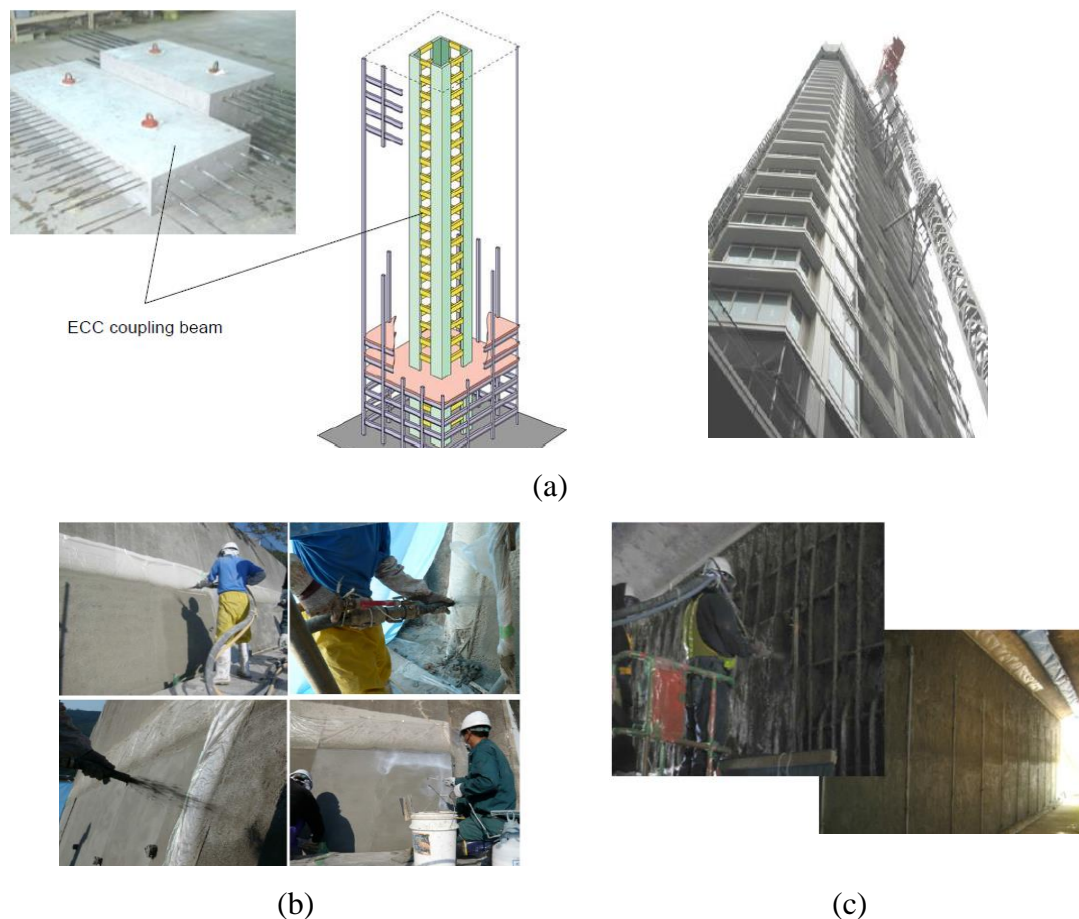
Application of *ECC* in civil engineering projects (a) *ECC* coupling beam in Nabeure Yokohama Tower (b) resurfacing of an ASR (alkali silica reaction) damaged retaining wall in Japan (c) Replacement of chloride-contaminated concrete on a motorway bridge [Polymers (2010)].
